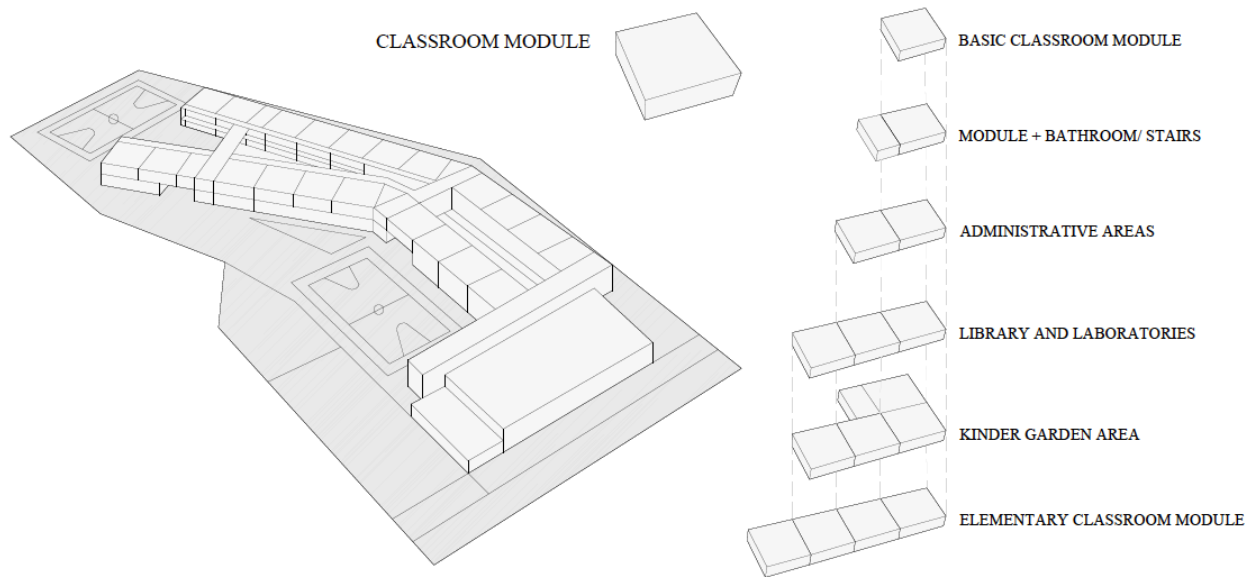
Architectural configuration for building prototype (Source: School 10)
